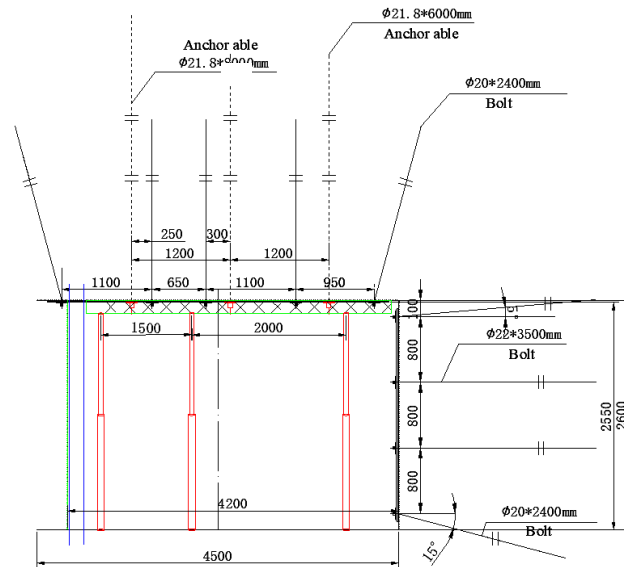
High-strength prop supporting scheme of 21311 entry retaining
